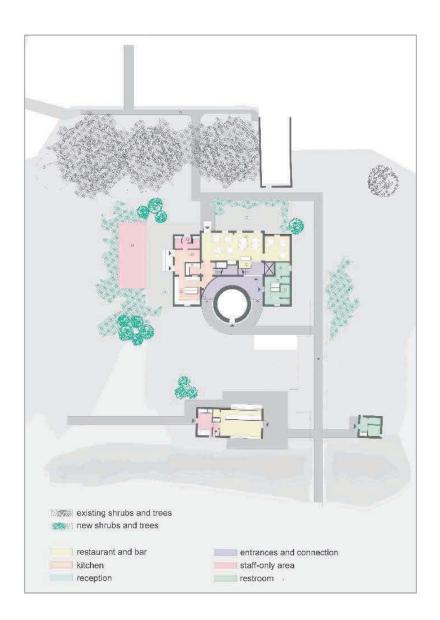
Goro Lighthouse: reuse general plan, ground floor
